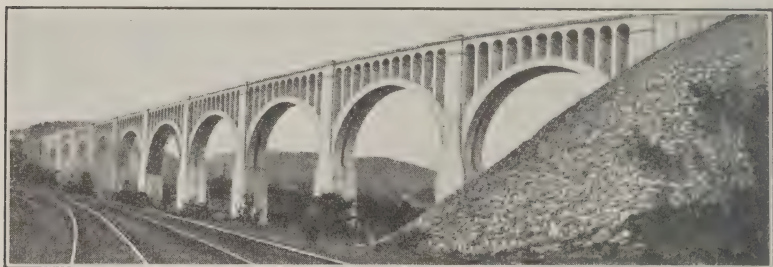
A concrete railroad bridge. Tunkhannock viaduct, Pennsylvania.
